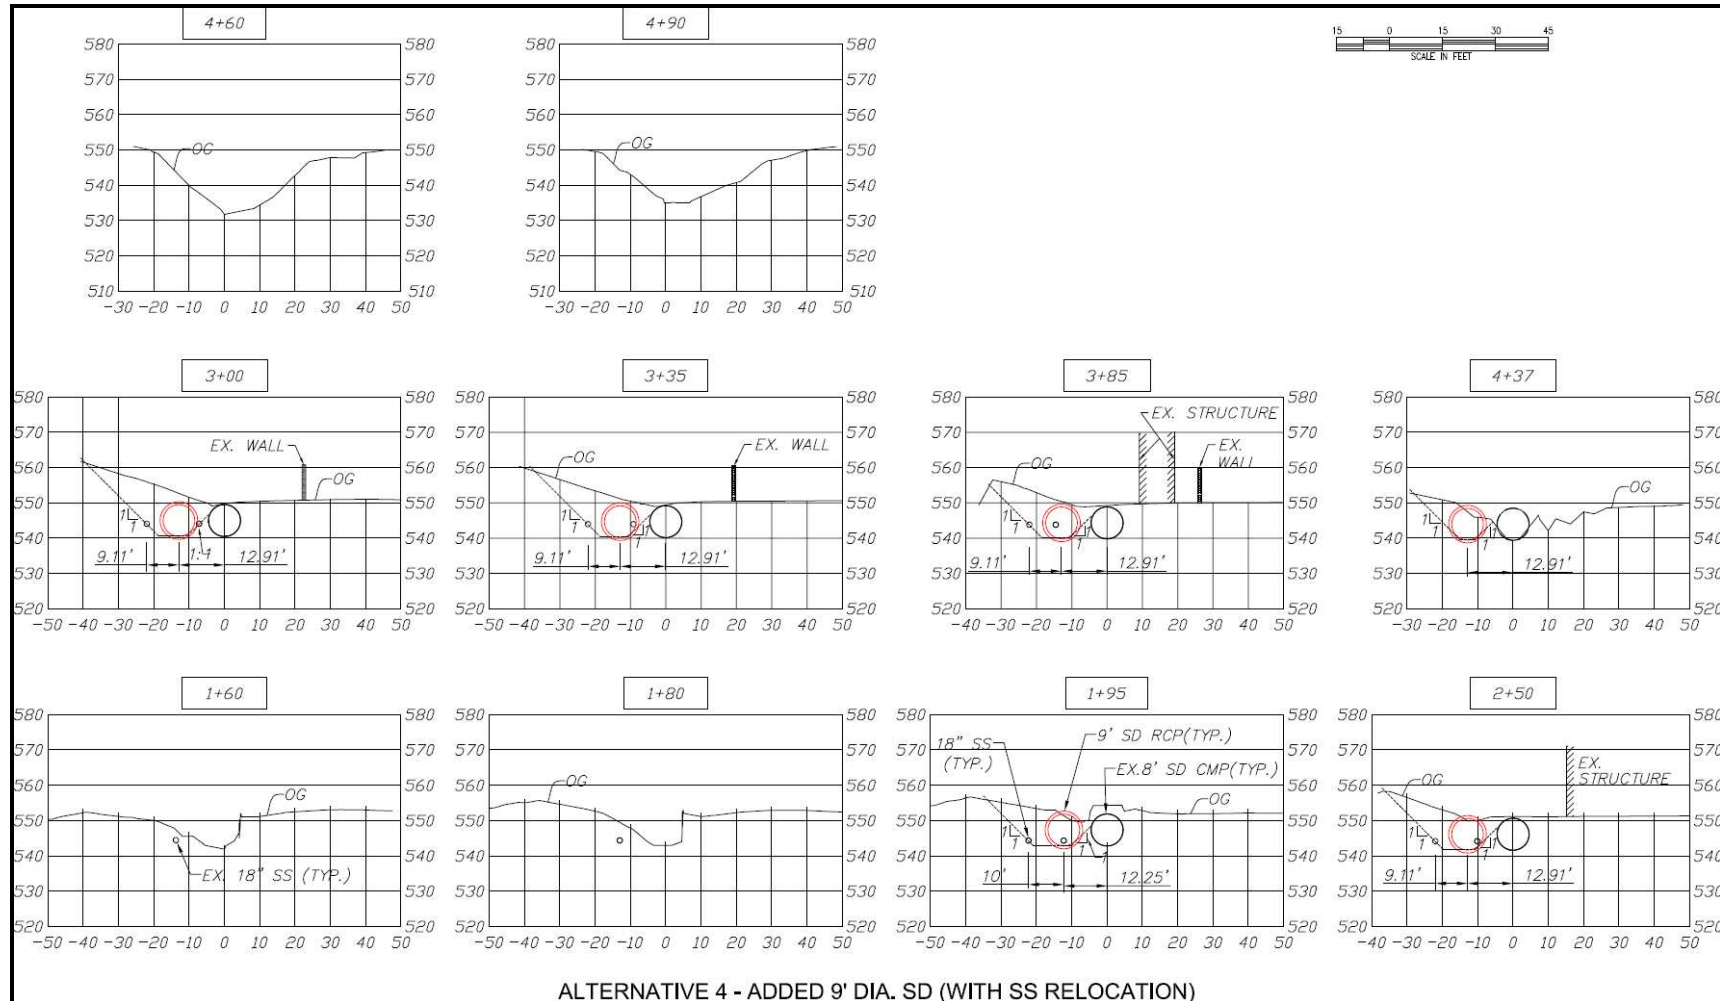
Cross Sections for Alternative 4 – Parallel 9-ft RCP and Sewer Line Relocation
